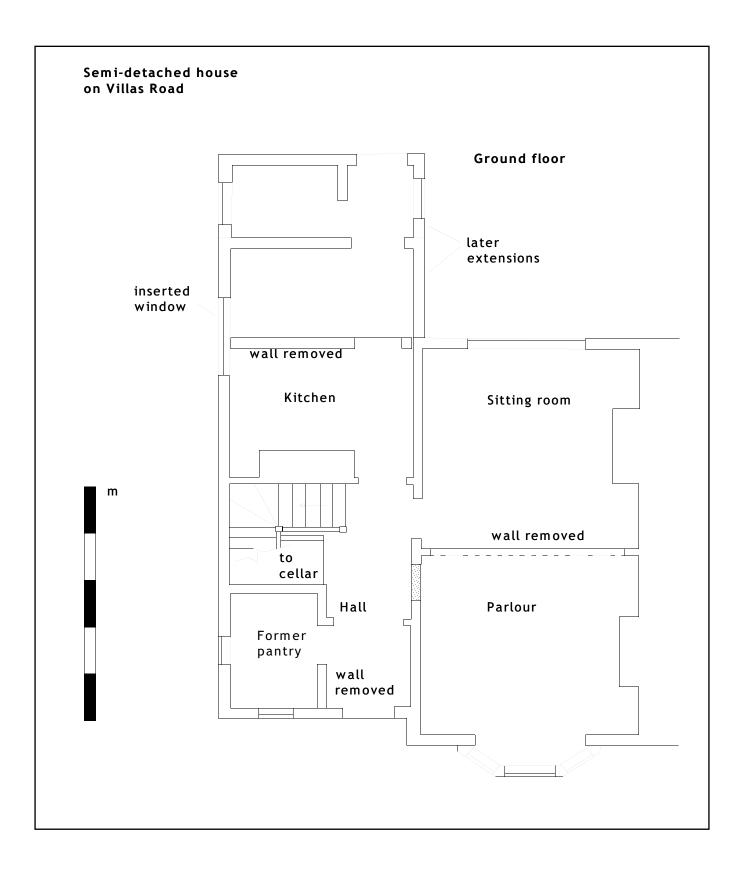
Ground floor plan of one of the semi-detached former officials' houses on Villas Road, New Bolsover. Not to scale.
